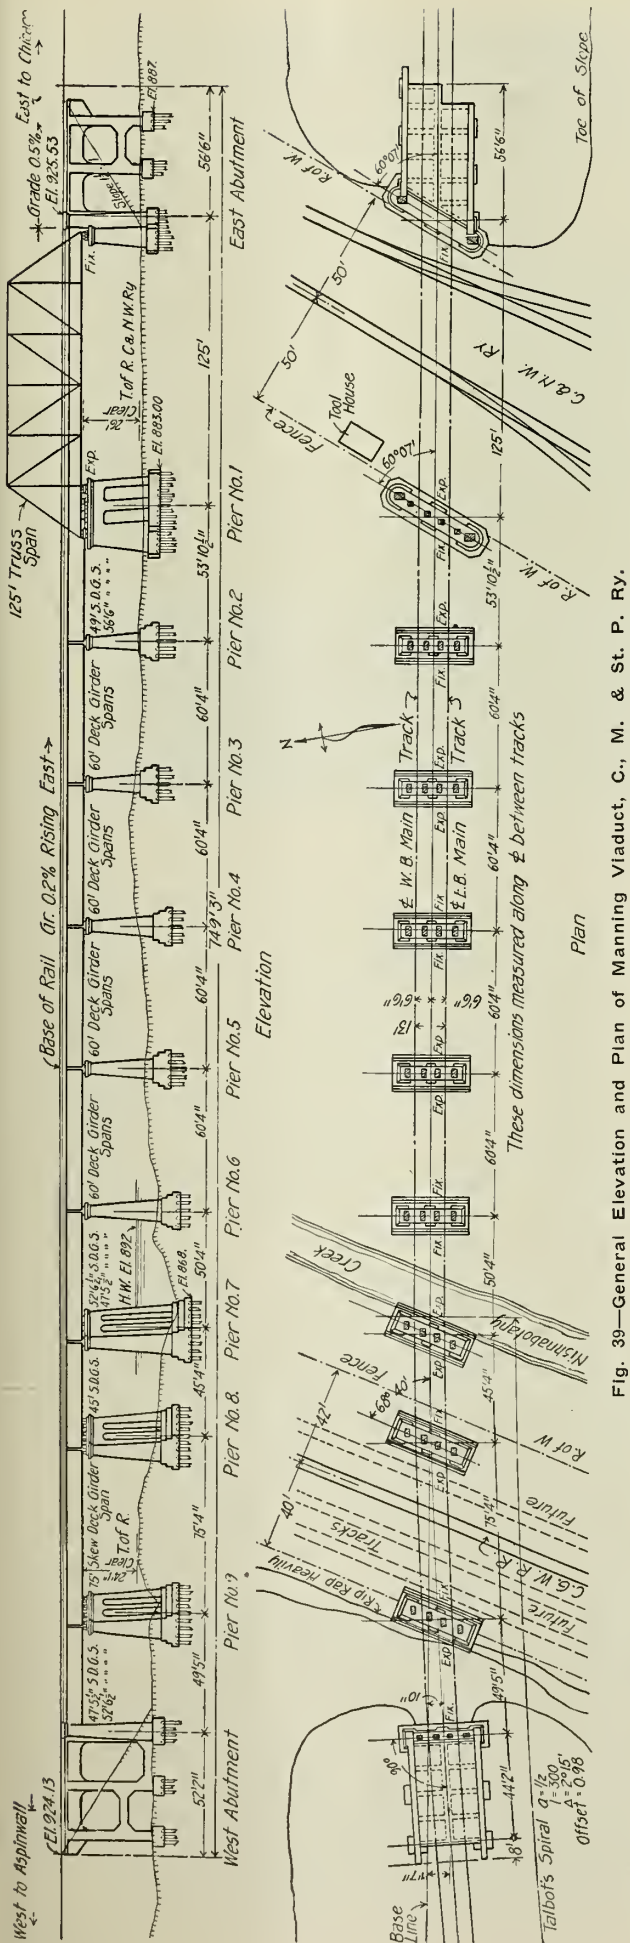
General Elevation and Plan of Manning Viaduct, C., M. & St. P. Ry.
